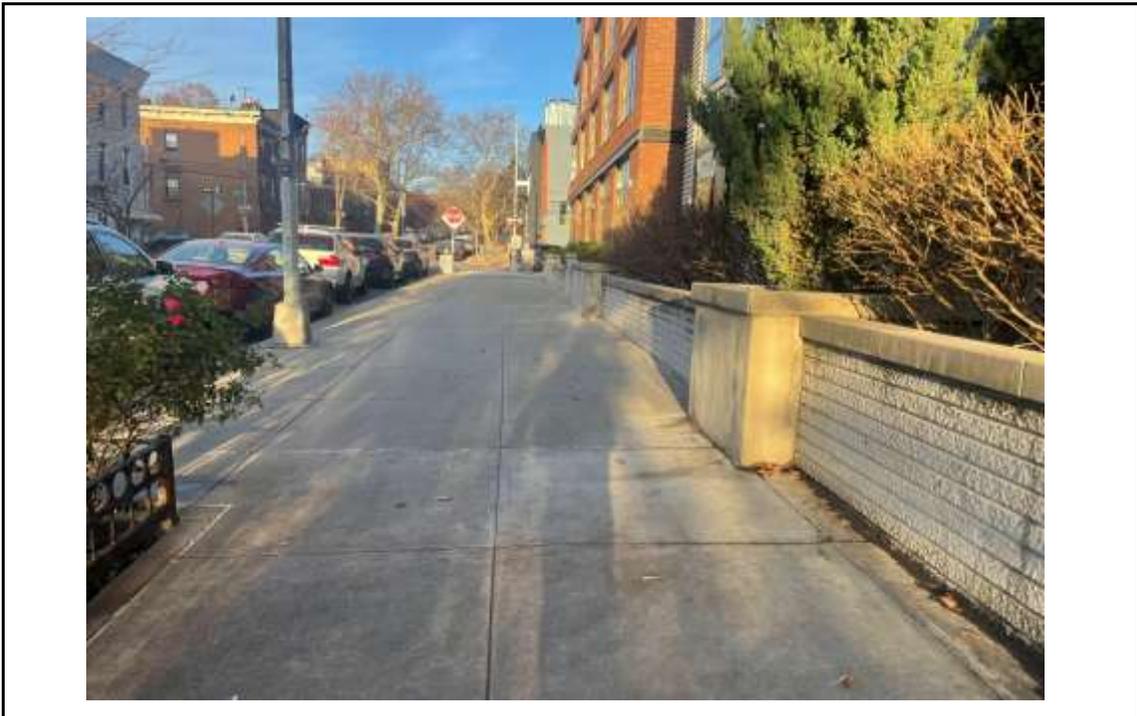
2nd Street sidewalk, facing northwest. 05 December 2023.
